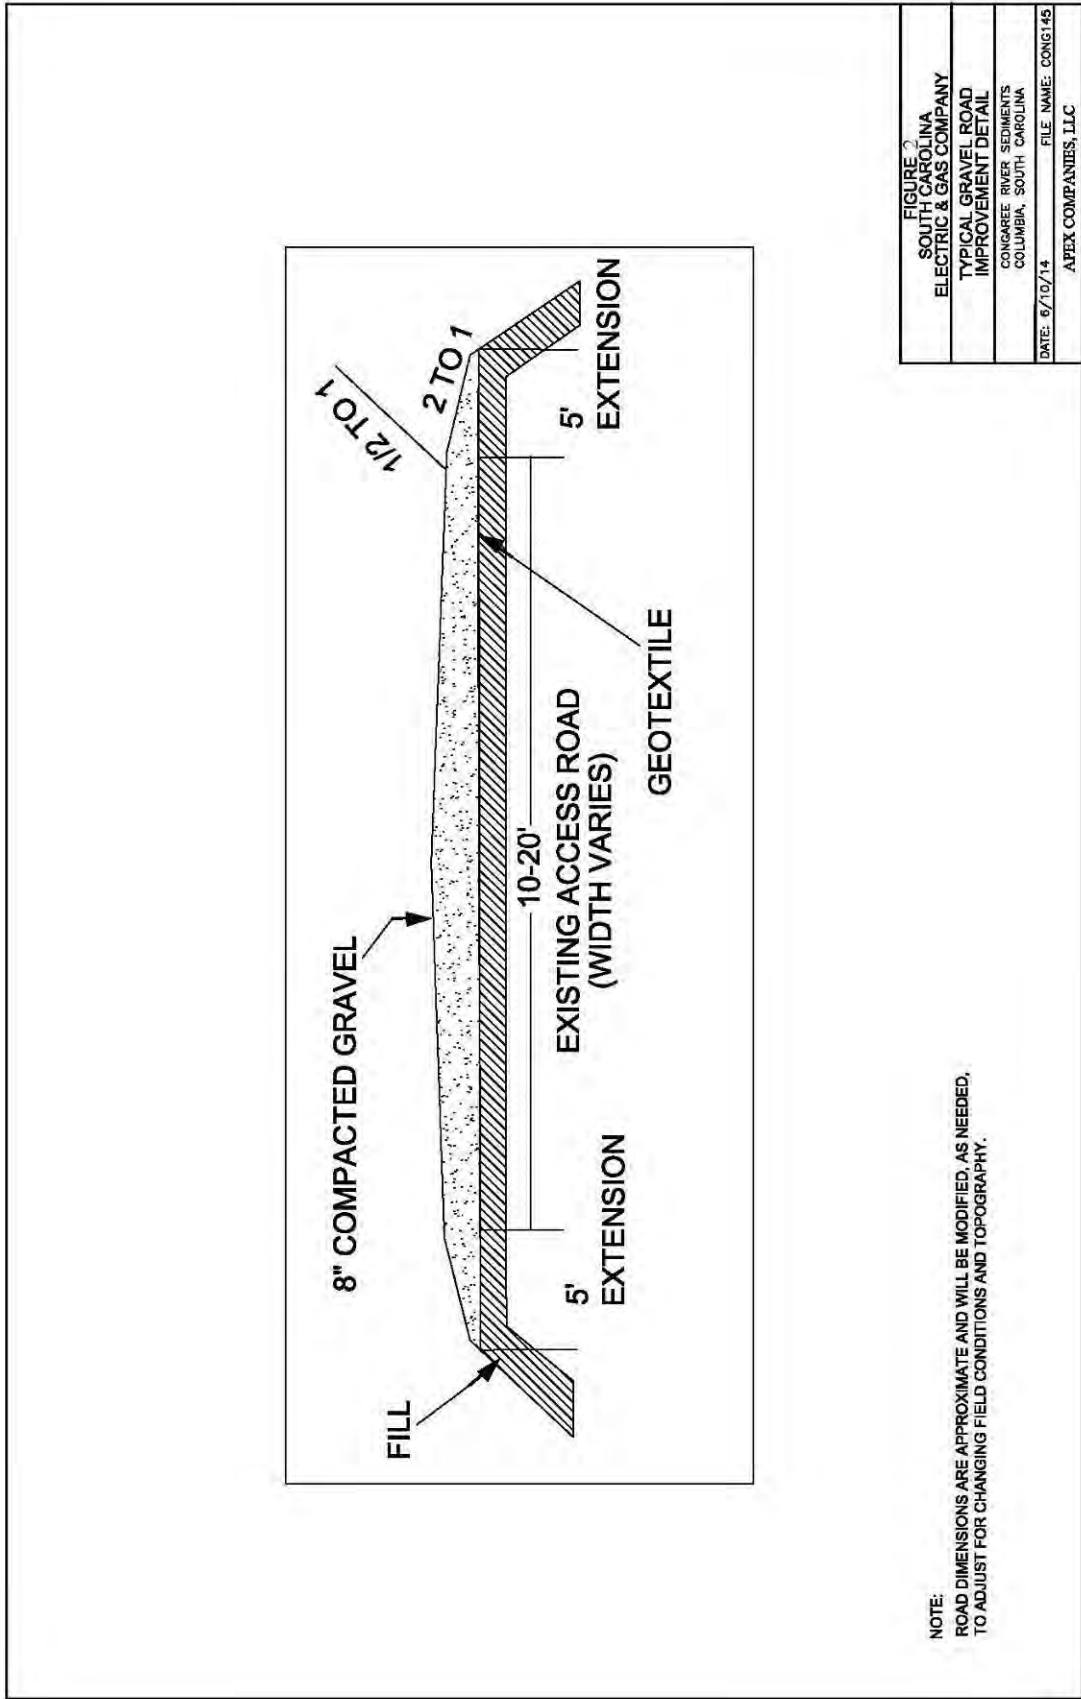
Conceptual construction plan for proposed access roads and improvements.
